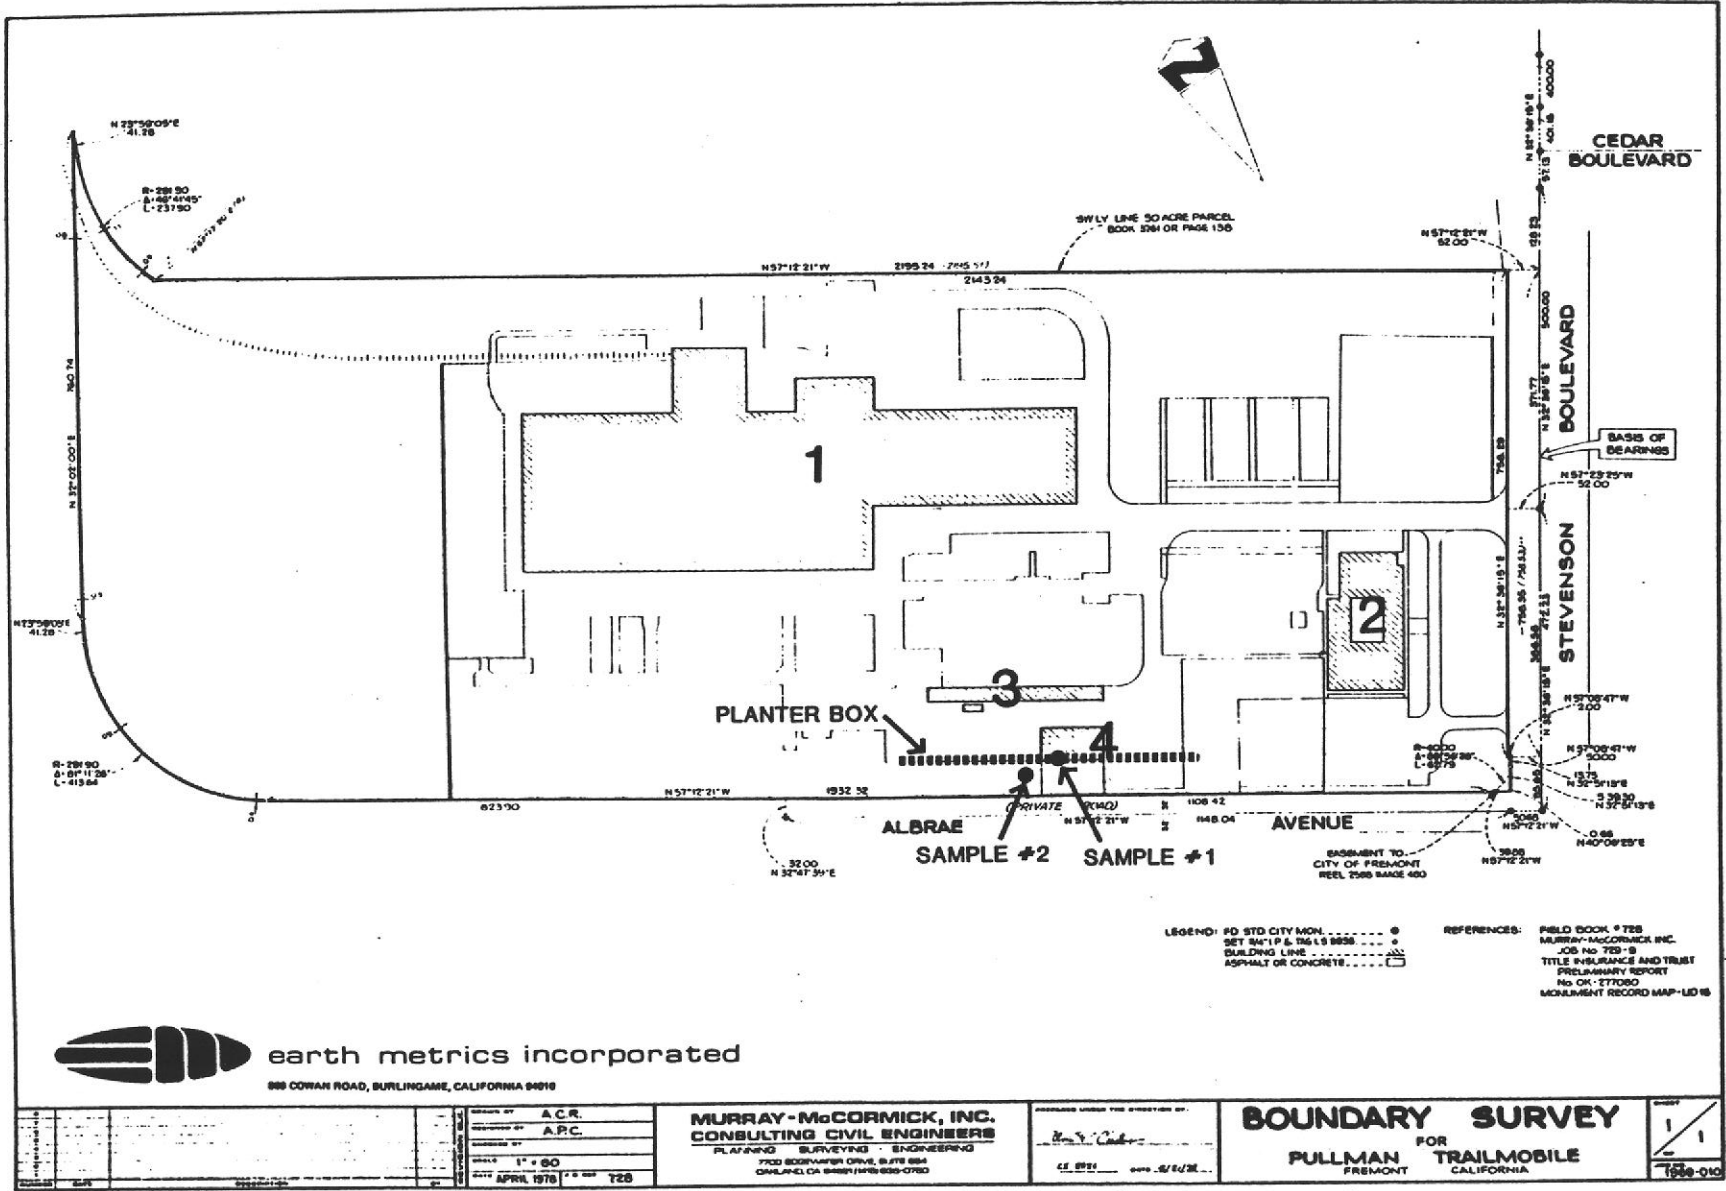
LOCATIONS OF FORMER CALIFORNIA OIL RECYCLES (BUILDING #4) EXISTING LANDSCAPED PLANTER AND SOIL SAMPLES
